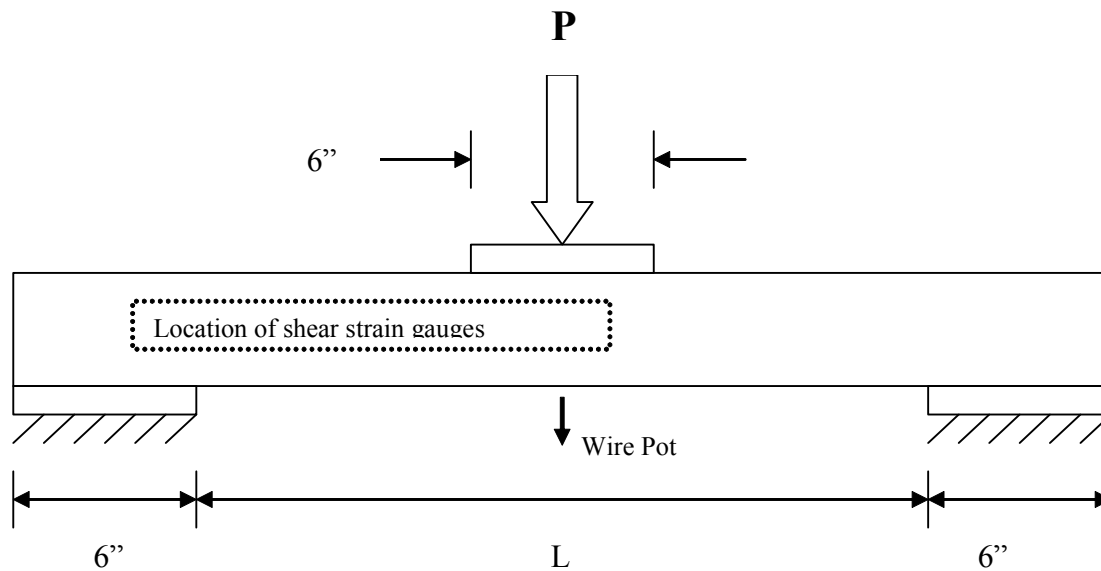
8 in. DWB short span testing instrumentation plan
